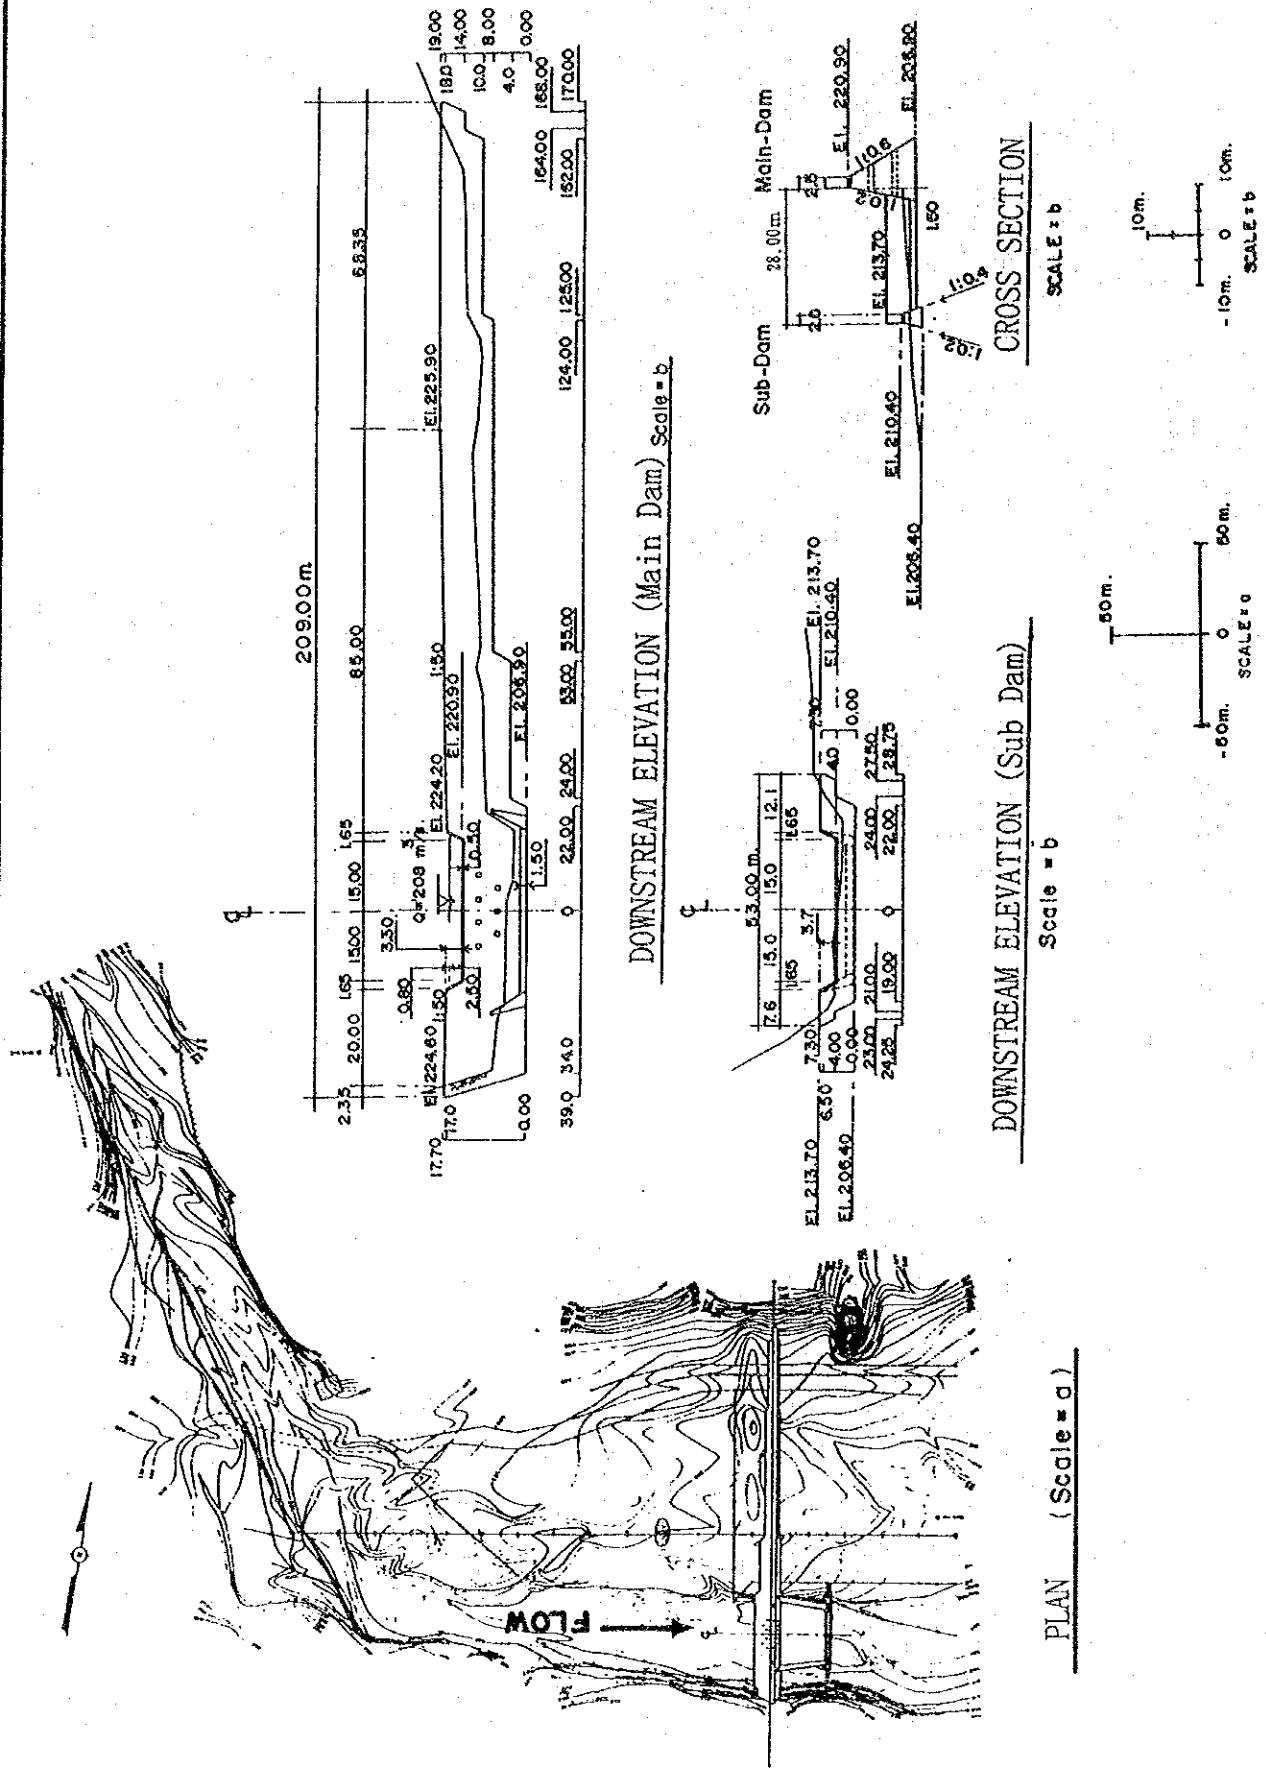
PROPOSED CHECK DAM NO. 1 (MAJAJINE DAM)
